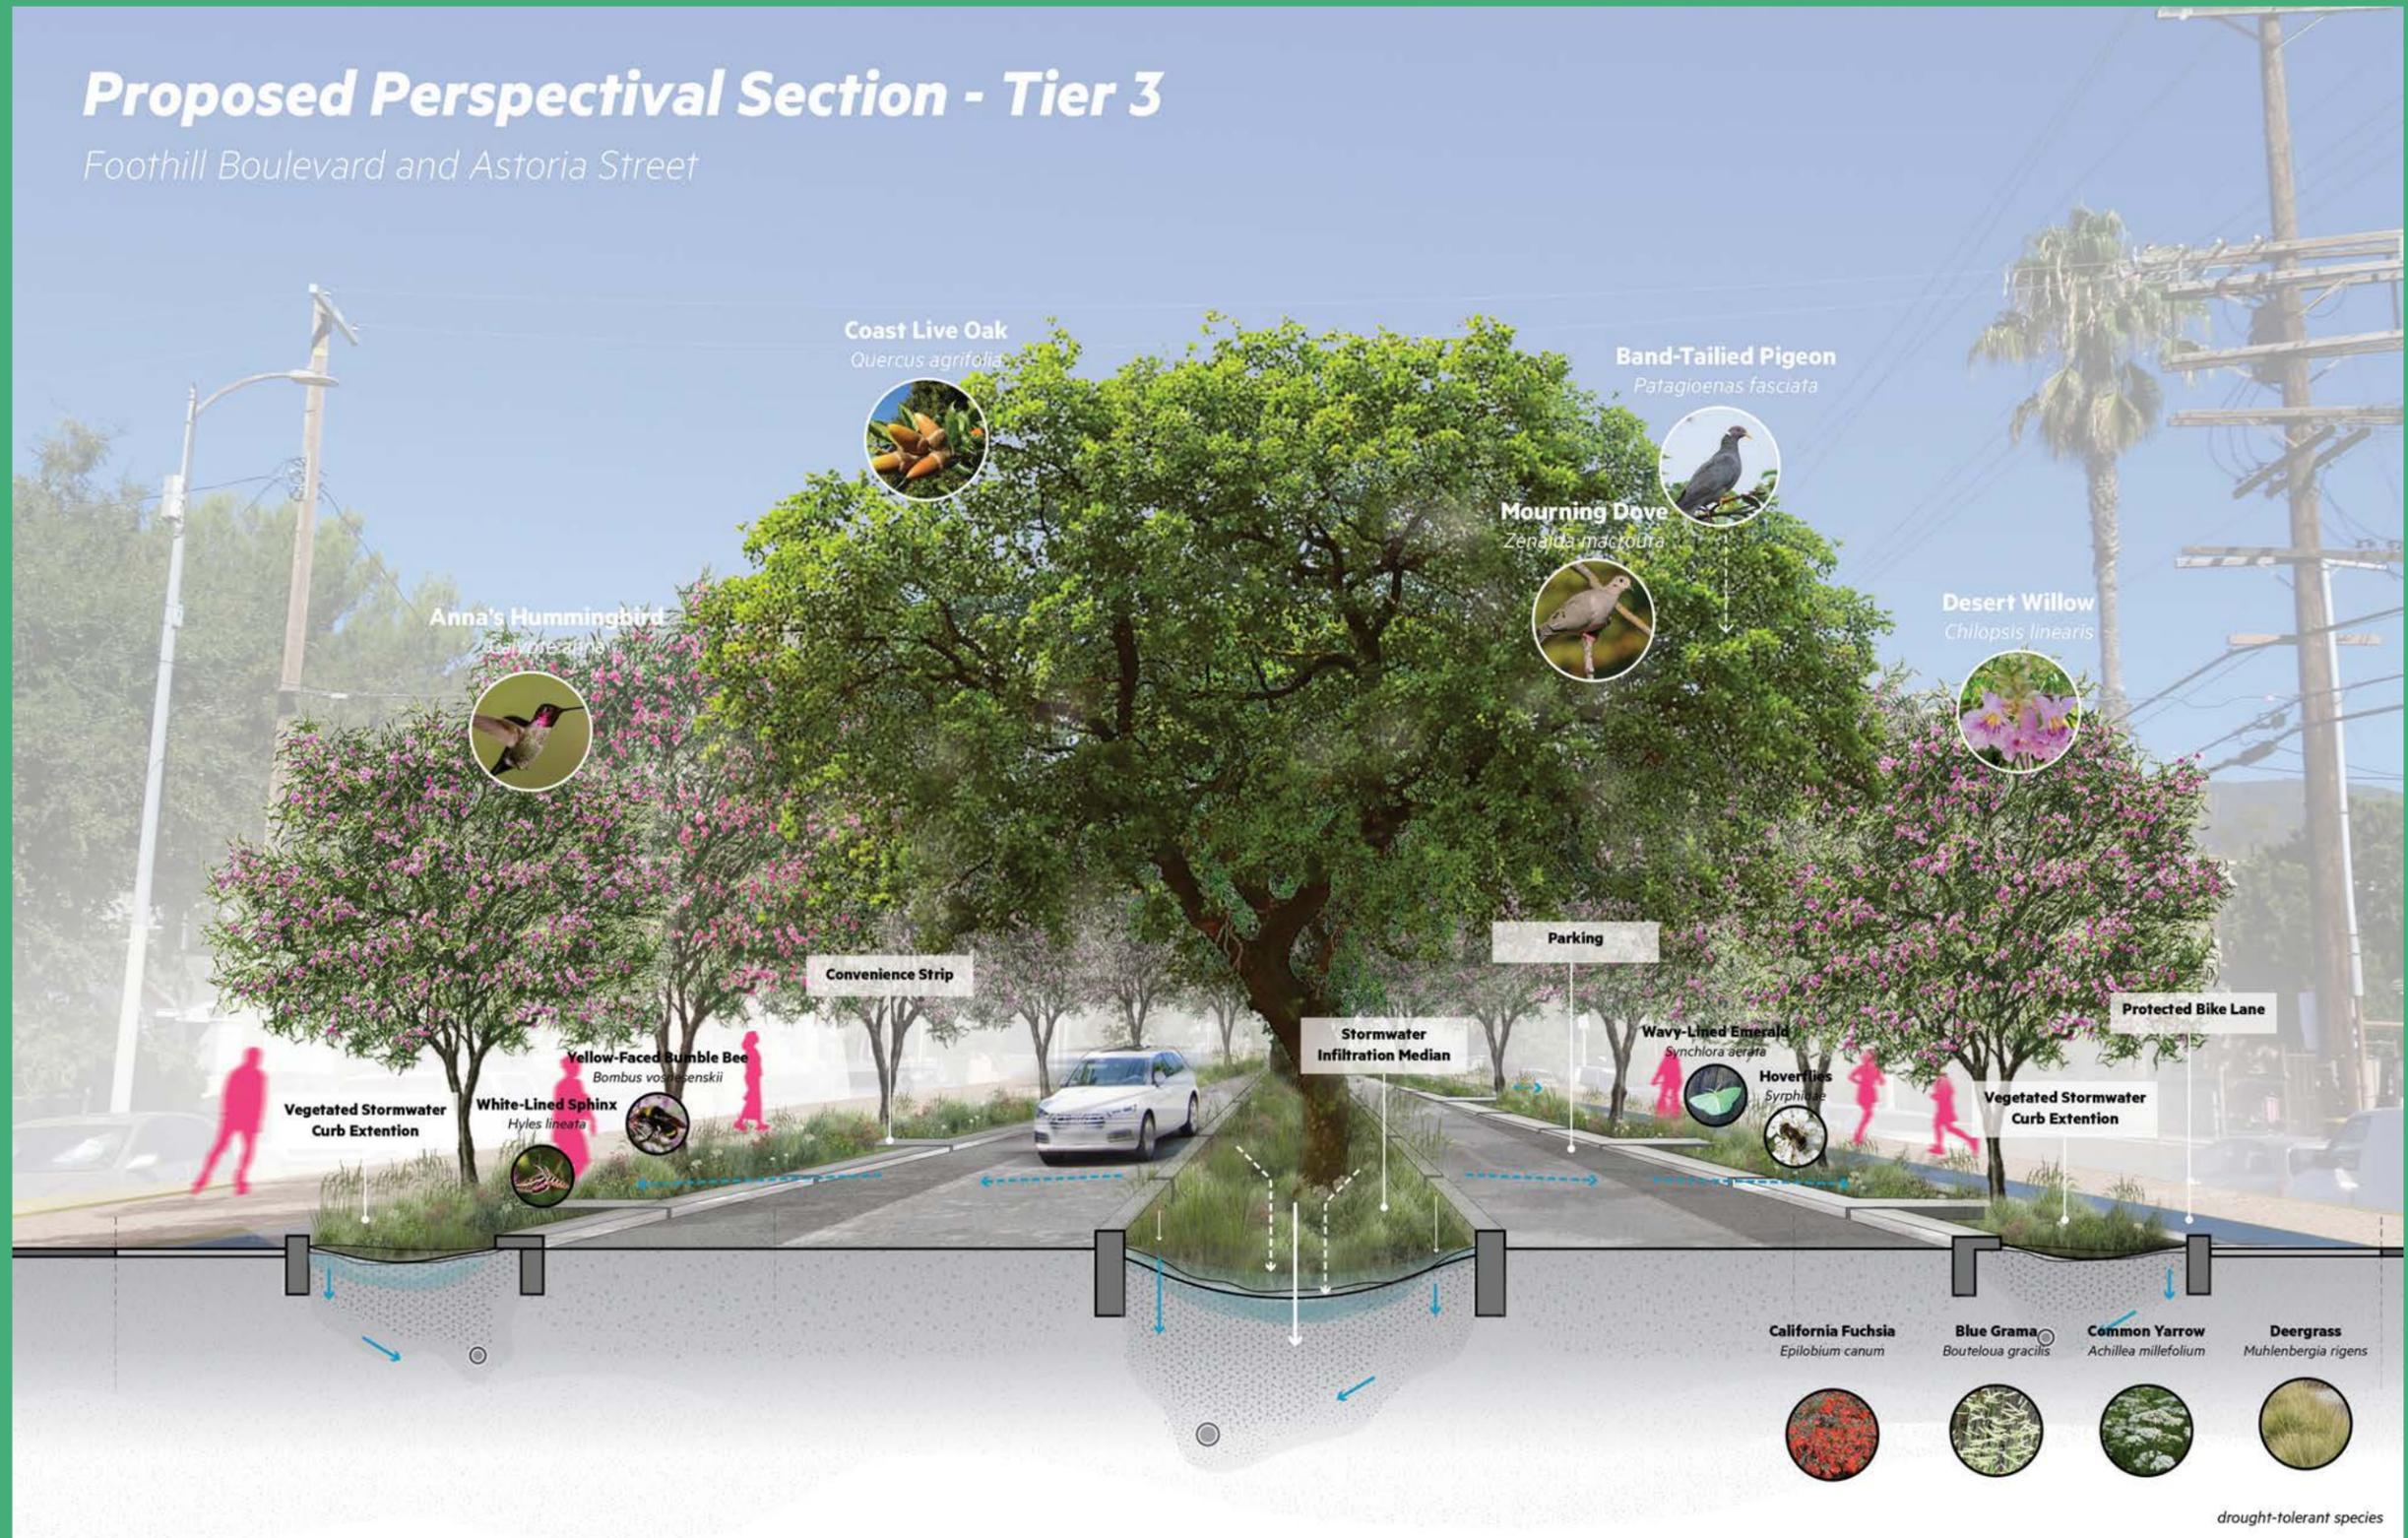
Foothill Boulevard and Astoria Street, proposed design, Tier 3
